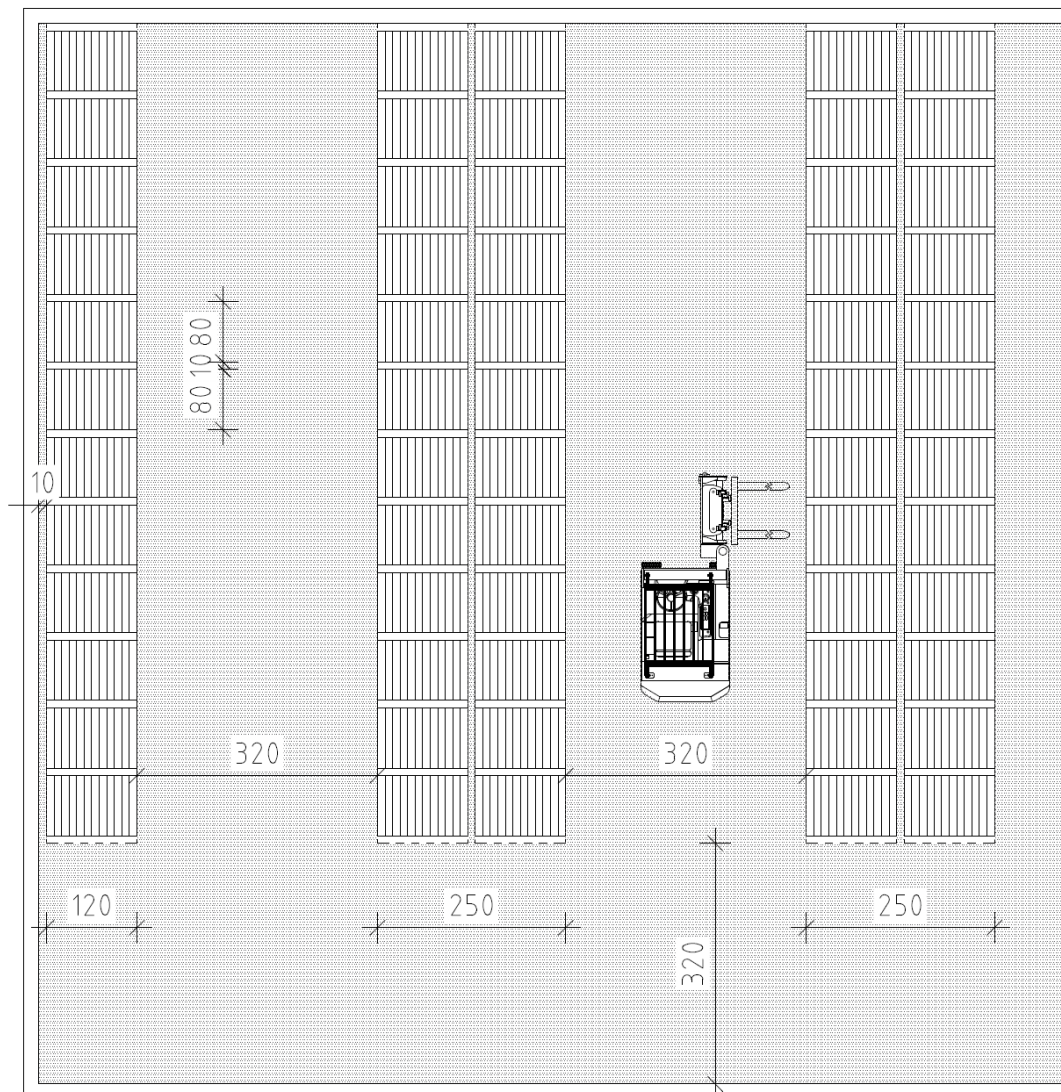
Presentation of pallet stacking in a standard rack warehouse - floor plan
